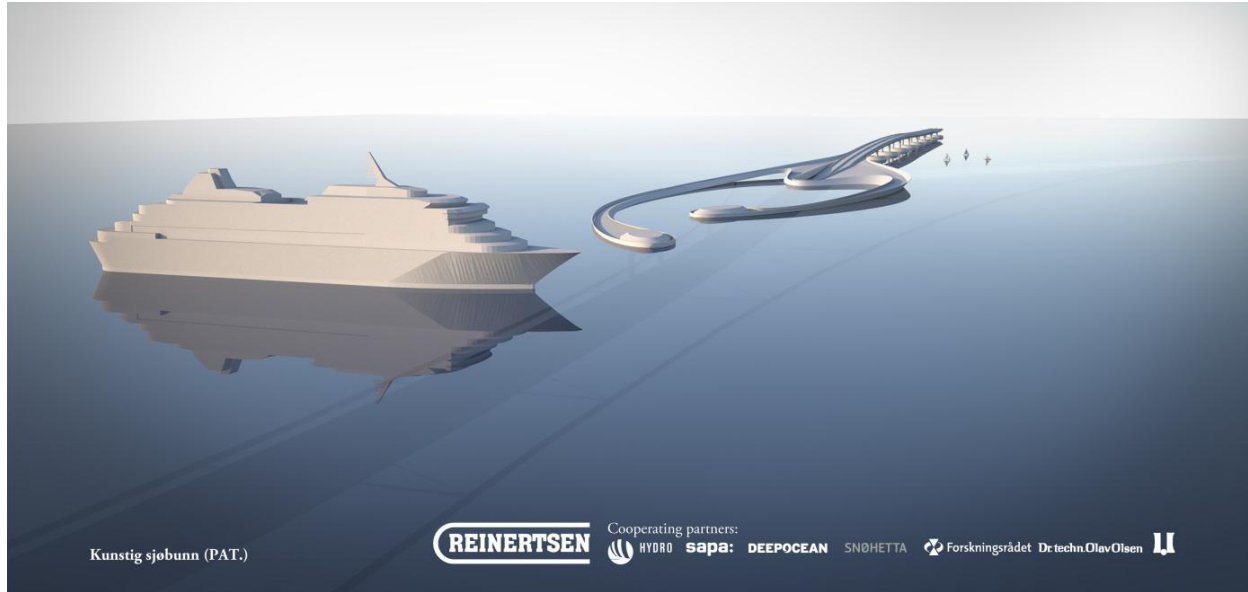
Collision barrier with floating bridge at rear and submerged floating tunnel with ship crossing in front
